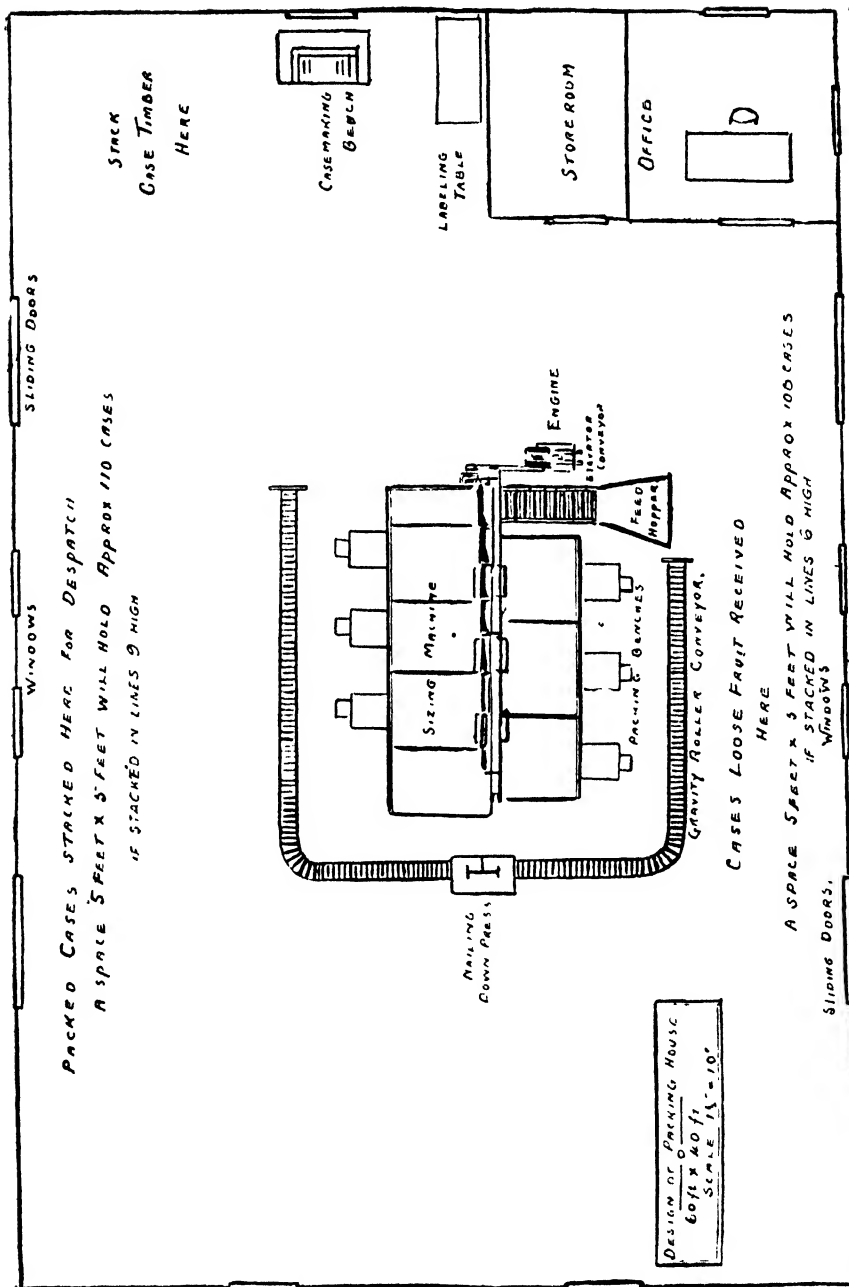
(Fig. 1).—PACKING SHED LAYOUT.
